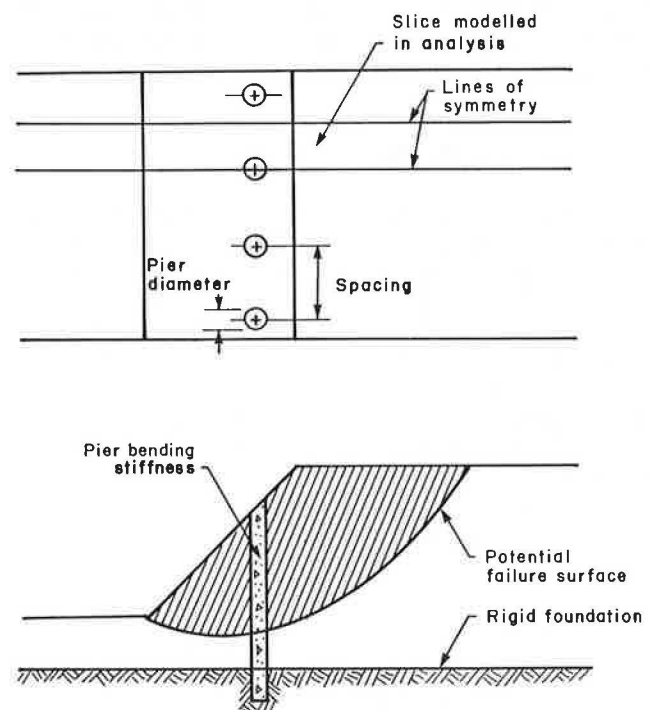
Discretely placed drilled piers for slope stabilization.
